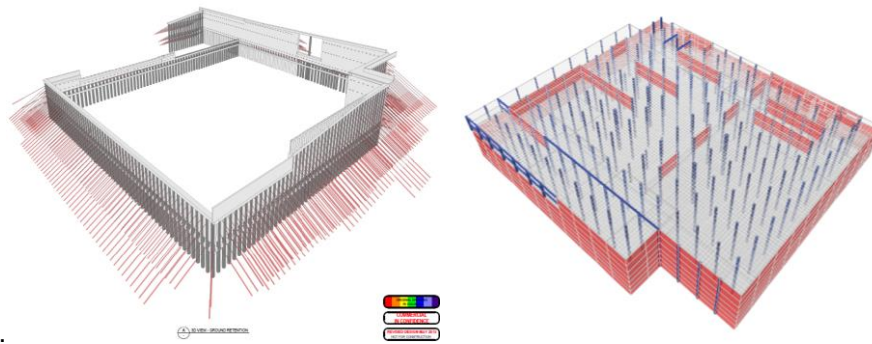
a) Ground retention and perimeter wall system b) foundation structure and walls between Level 1 and 3
